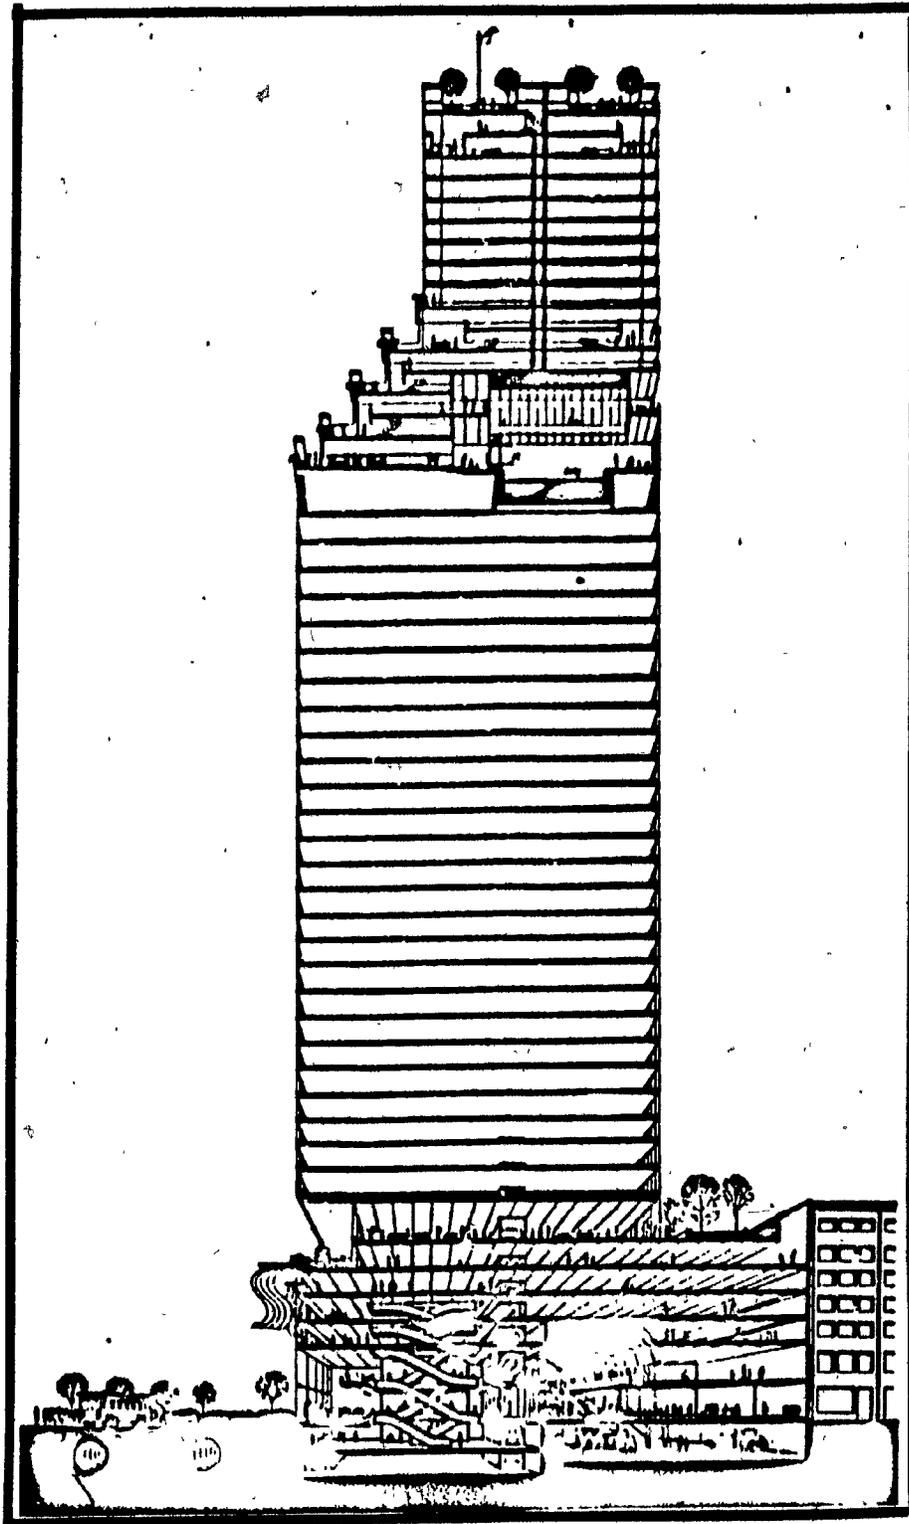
Prototypical Fifth Avenue mixed-use building.
